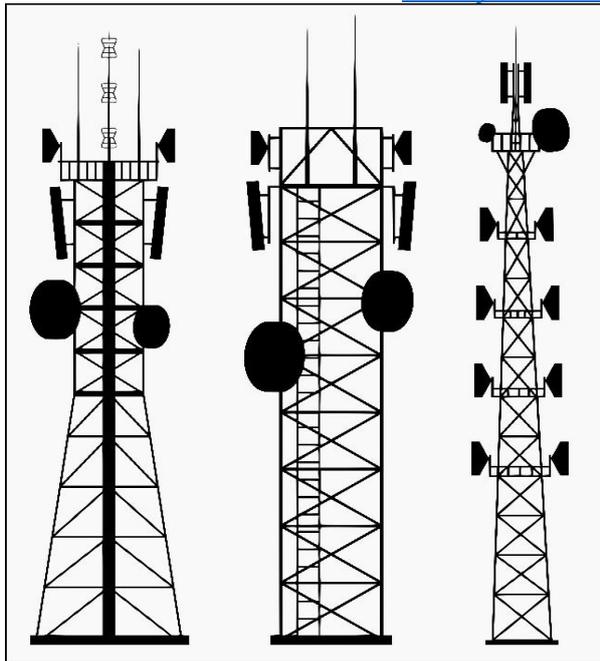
Examples of Lattice towers (Source: Adopted from Ubani, 2023).
